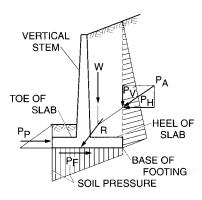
Gravity and semigravity retaining walls. (*From NAVFAC DM-7.2*, 1982.)
